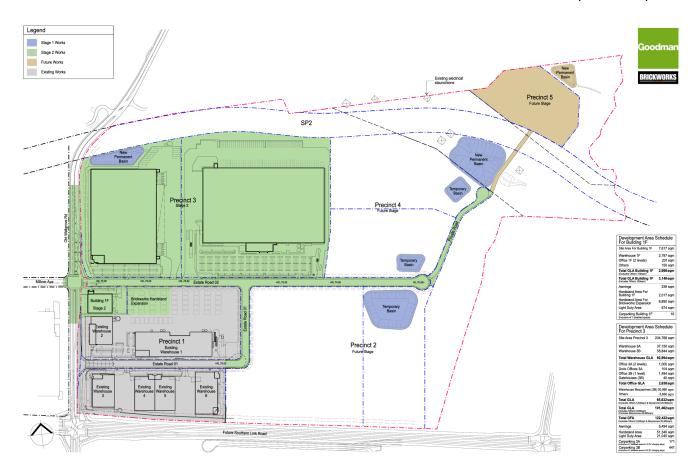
Building Stage Plan (Stage 2 Works) of Oakdale East Industrial Estate
